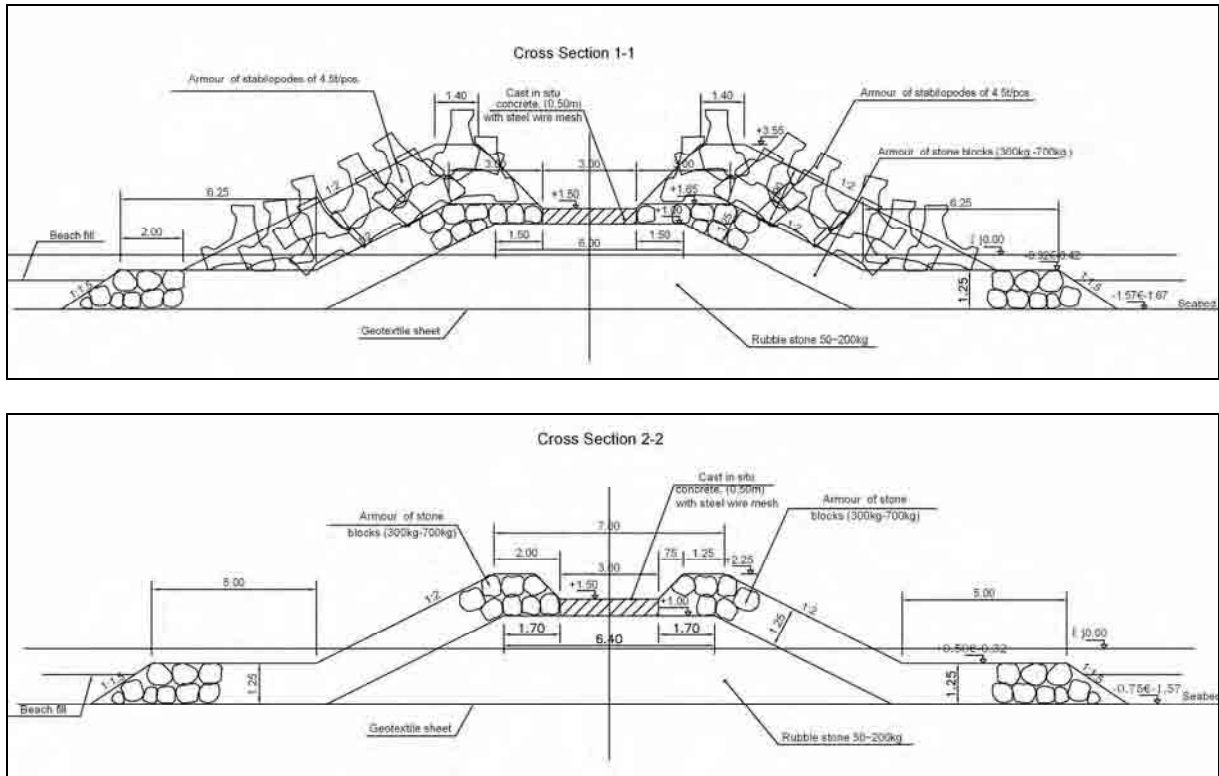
(1): Cross sections 1-1 and 2-2 of sand-retaining jetty
